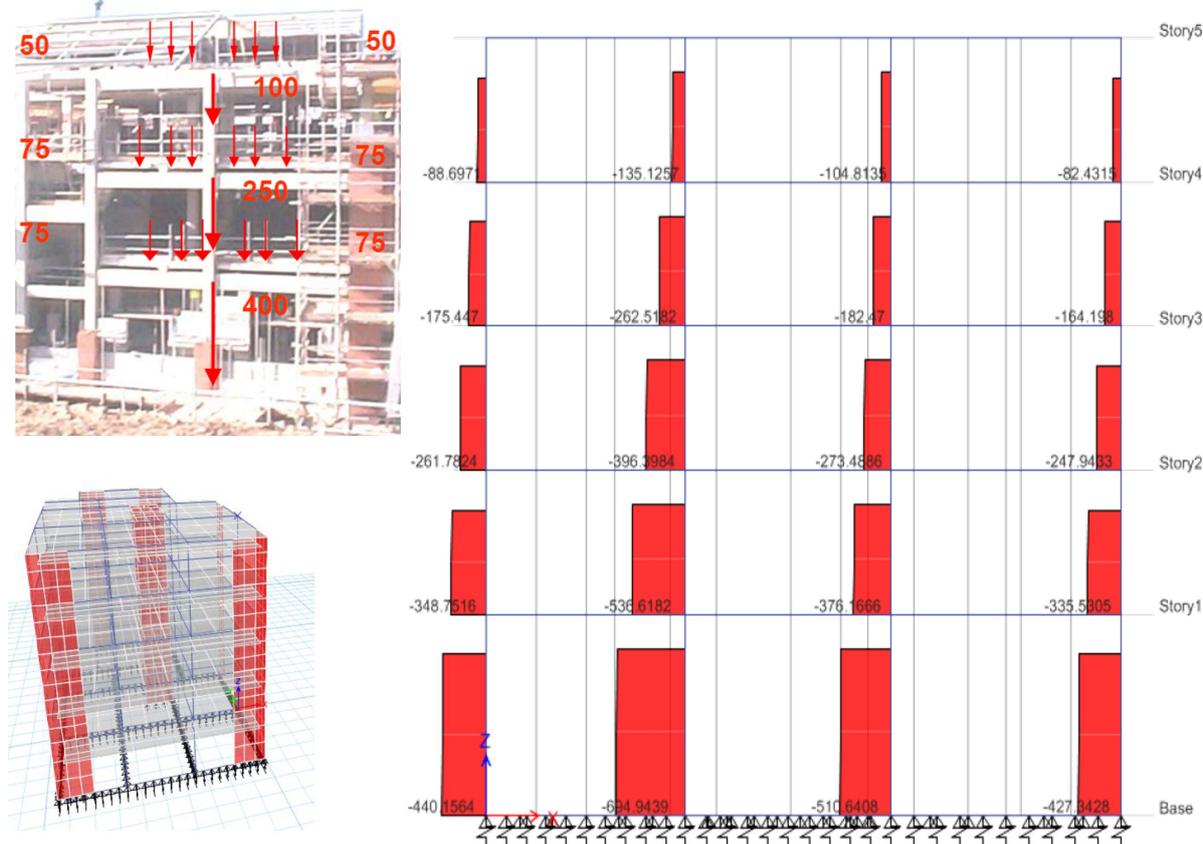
Axial force diagram for a typical column in a multistory frame building under vertical loads, illustrating the progressive increase in axial force from the top to the bottom as loads from each floor accumulate.
